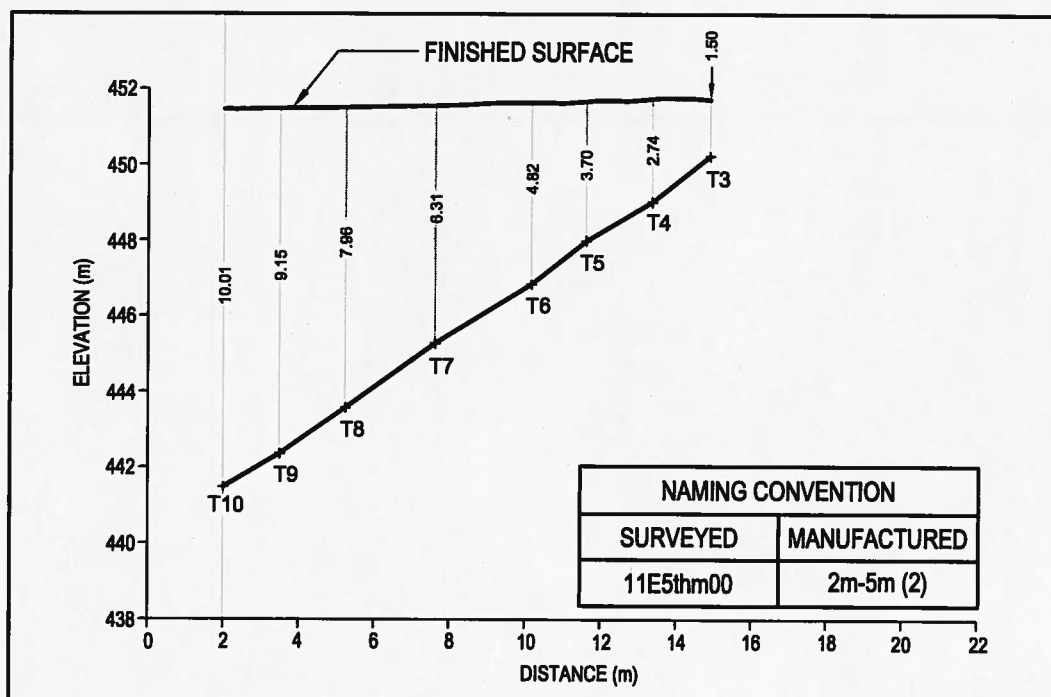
11E5thm00 (2m-5m (2)) - AS MANUFACTURED, PLAN, AND SECTION
